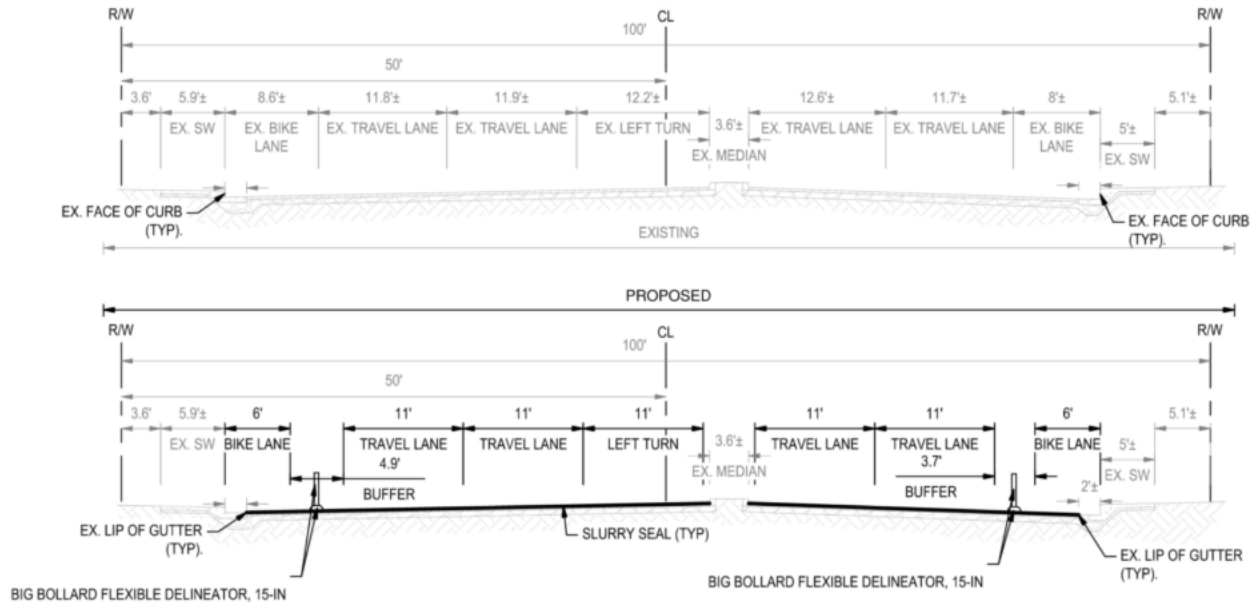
Typical cross section (Whisman Road to Bernardo Avenue)
